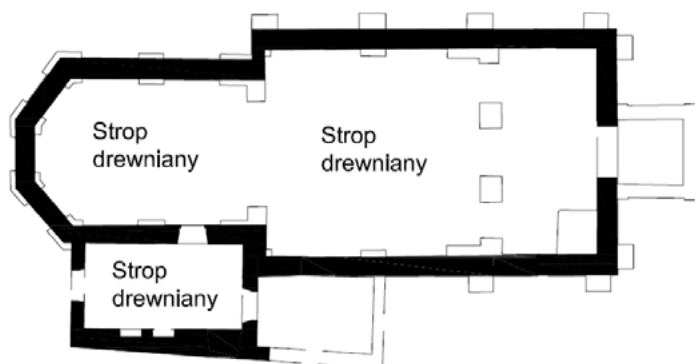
Plan of the ground floor of the sacristy, brick wall below the land level was marked with hachure
